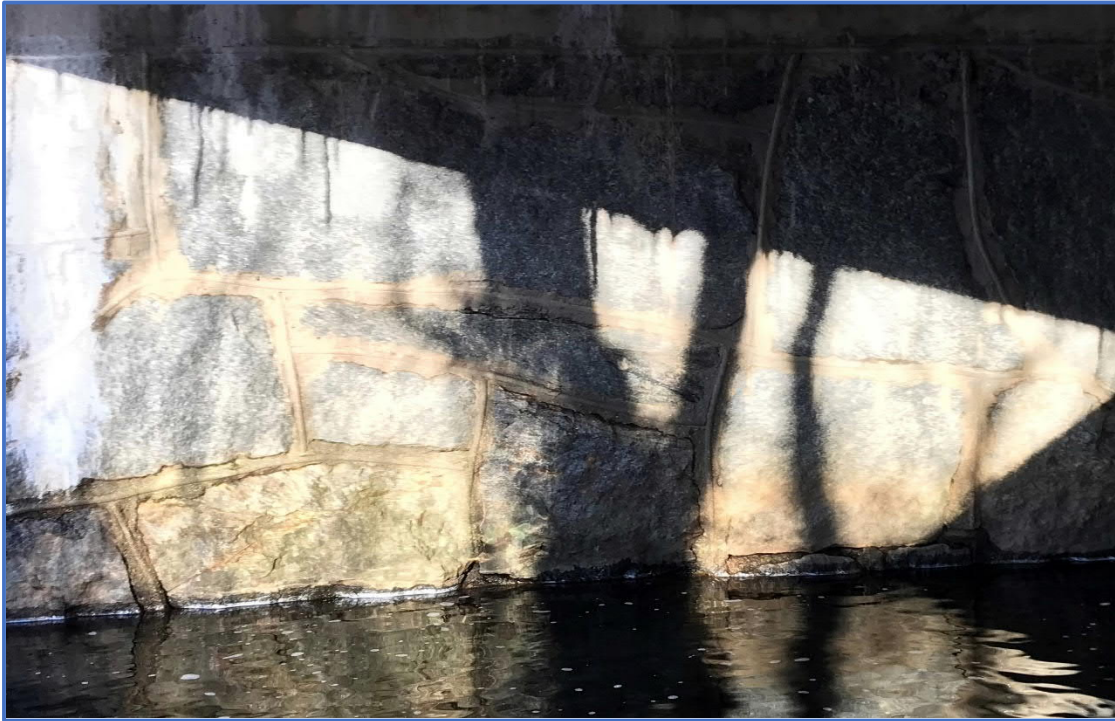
Typical cracking at mortar joints at west abutment
